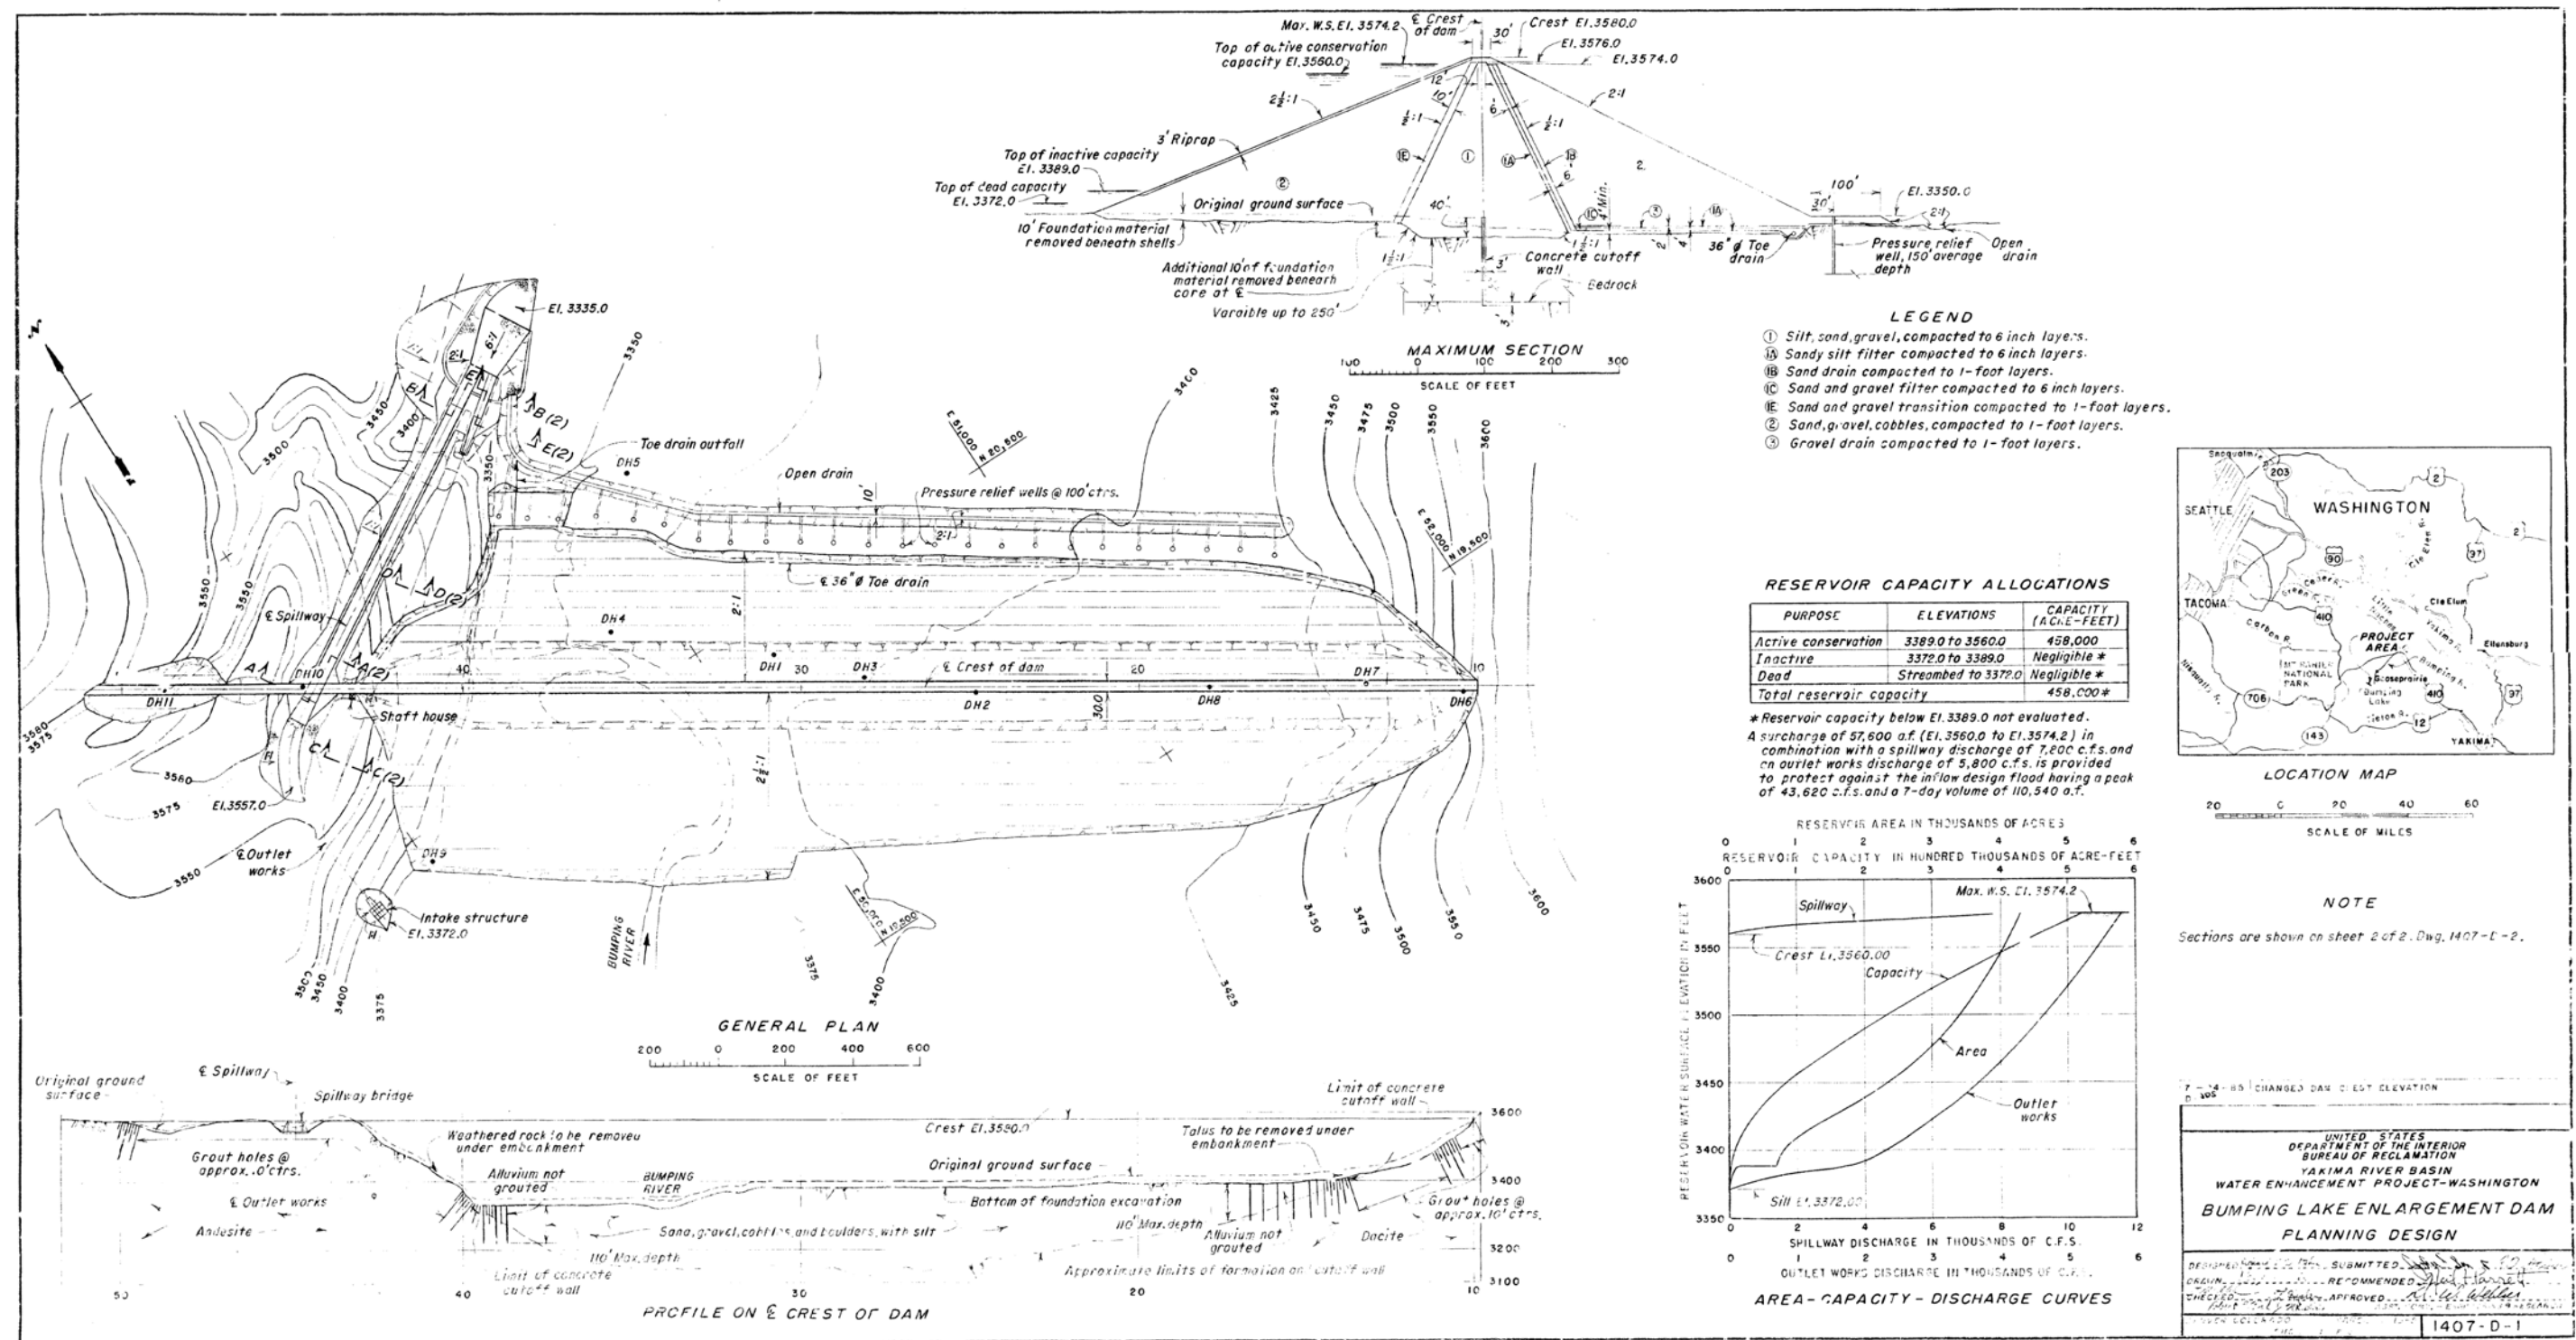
Bumping Lake Enlargement Planning Design (1985).
